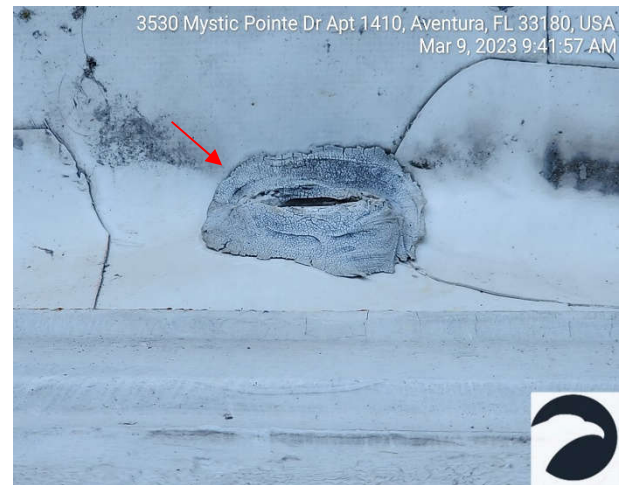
Cracked sealant around the penetration of the roofing system (Lower Roof)
